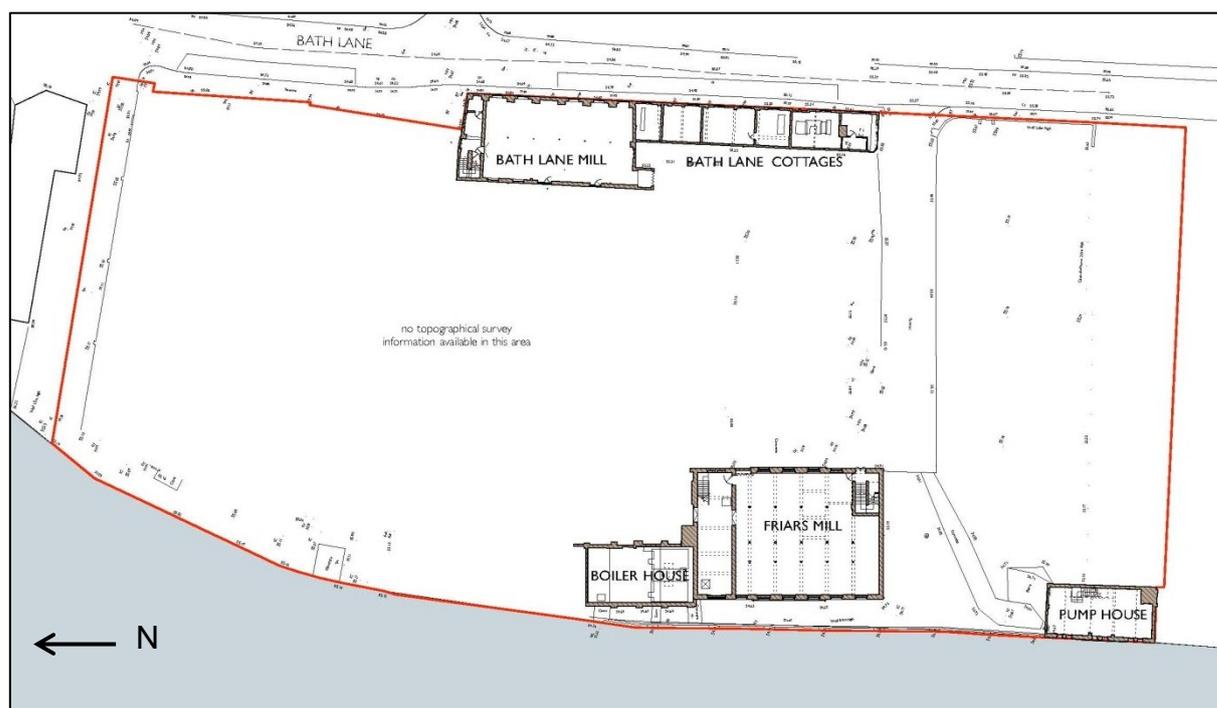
Site plan (supplied by Levitate Architects, not to scale).
